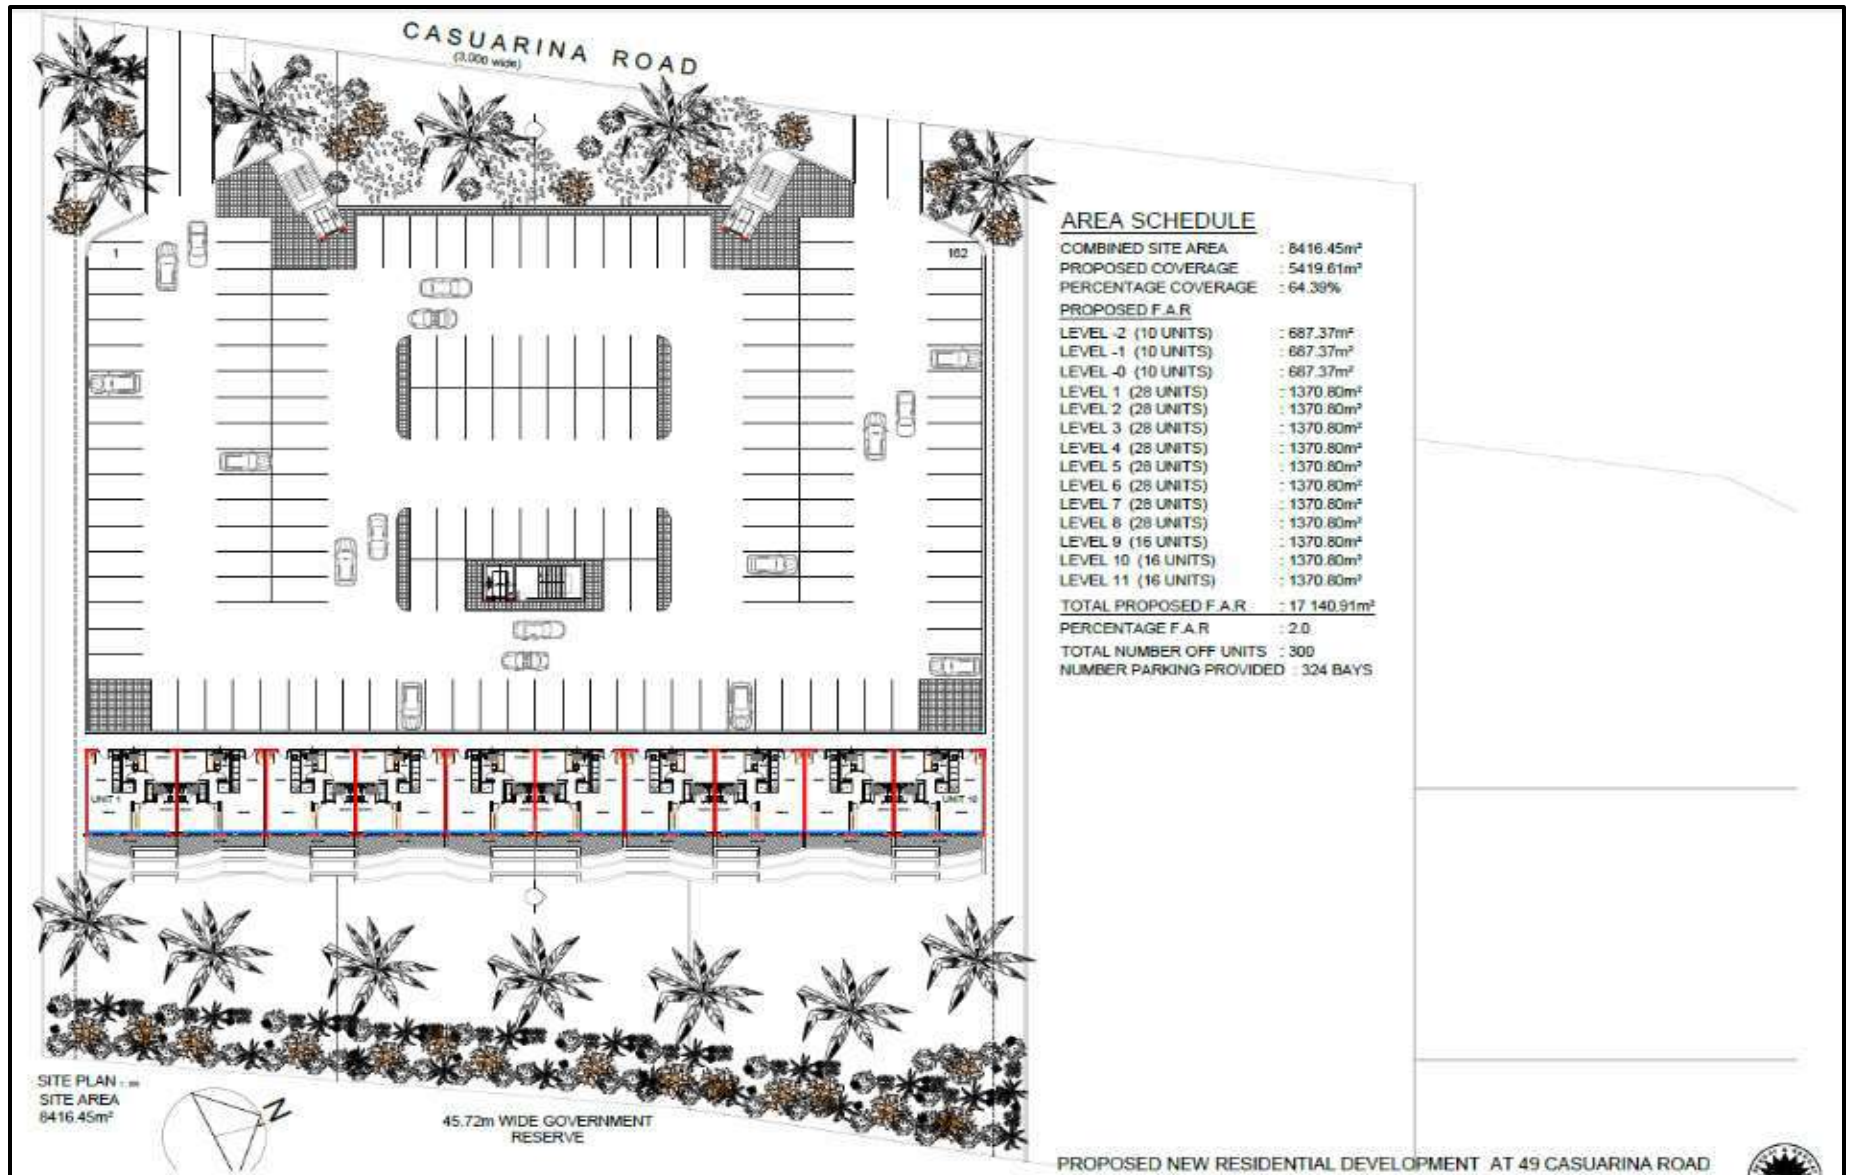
Alternative Layout Plan for Level 0 to -2 with Area Schedule
